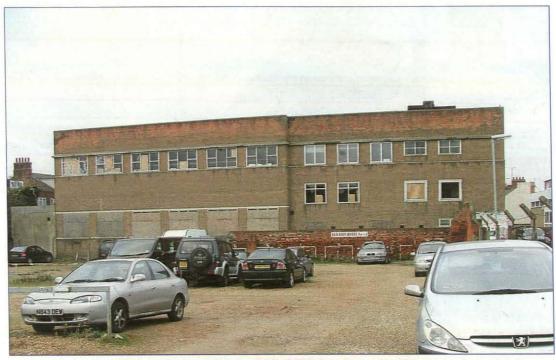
View looking north-west of the south-east elevation of the Old Telephone Exchange
